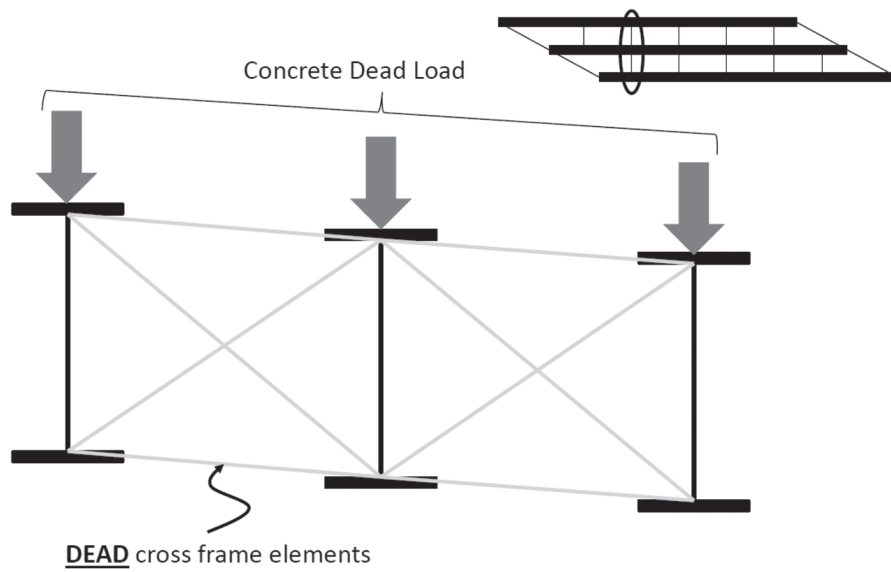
Application of concrete dead load on girders after killing cross-frame elements.
